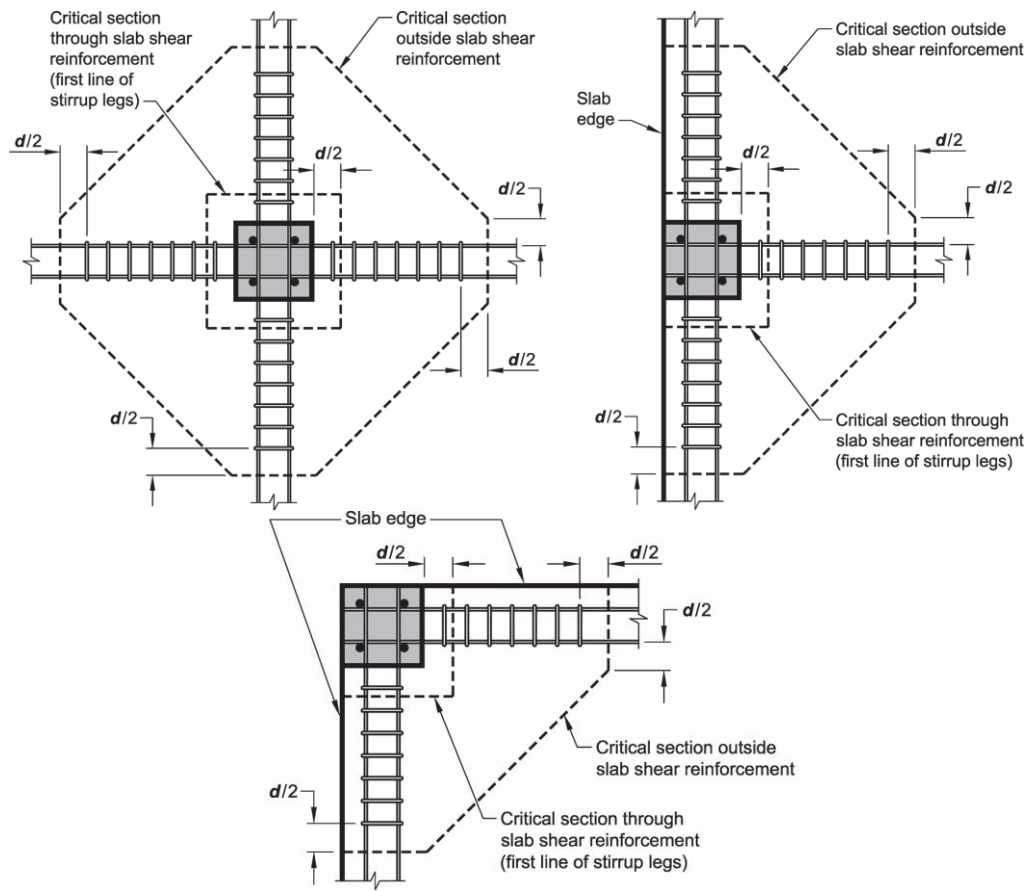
Critical sections for interior column, edge column, and corner columns respectively. (Adapted from ACI 318-14 22.6.4.2)
